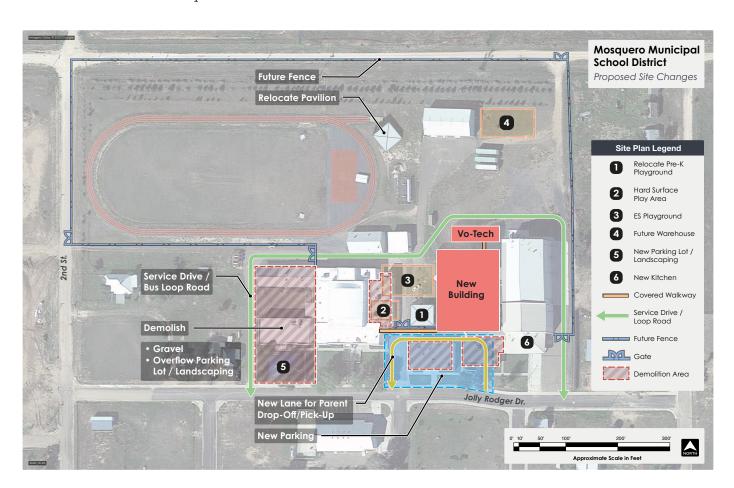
illustrates the new facility inserted into the site and shows which buildings would be demolished. With this configuration, the new building could be built north of the current Elementary School Building, without interruption of academic studies or a temporary relocation. The students can use the city park across the street for supervised play. Once it's built, then the demolition would occur and site improvements would commence.
